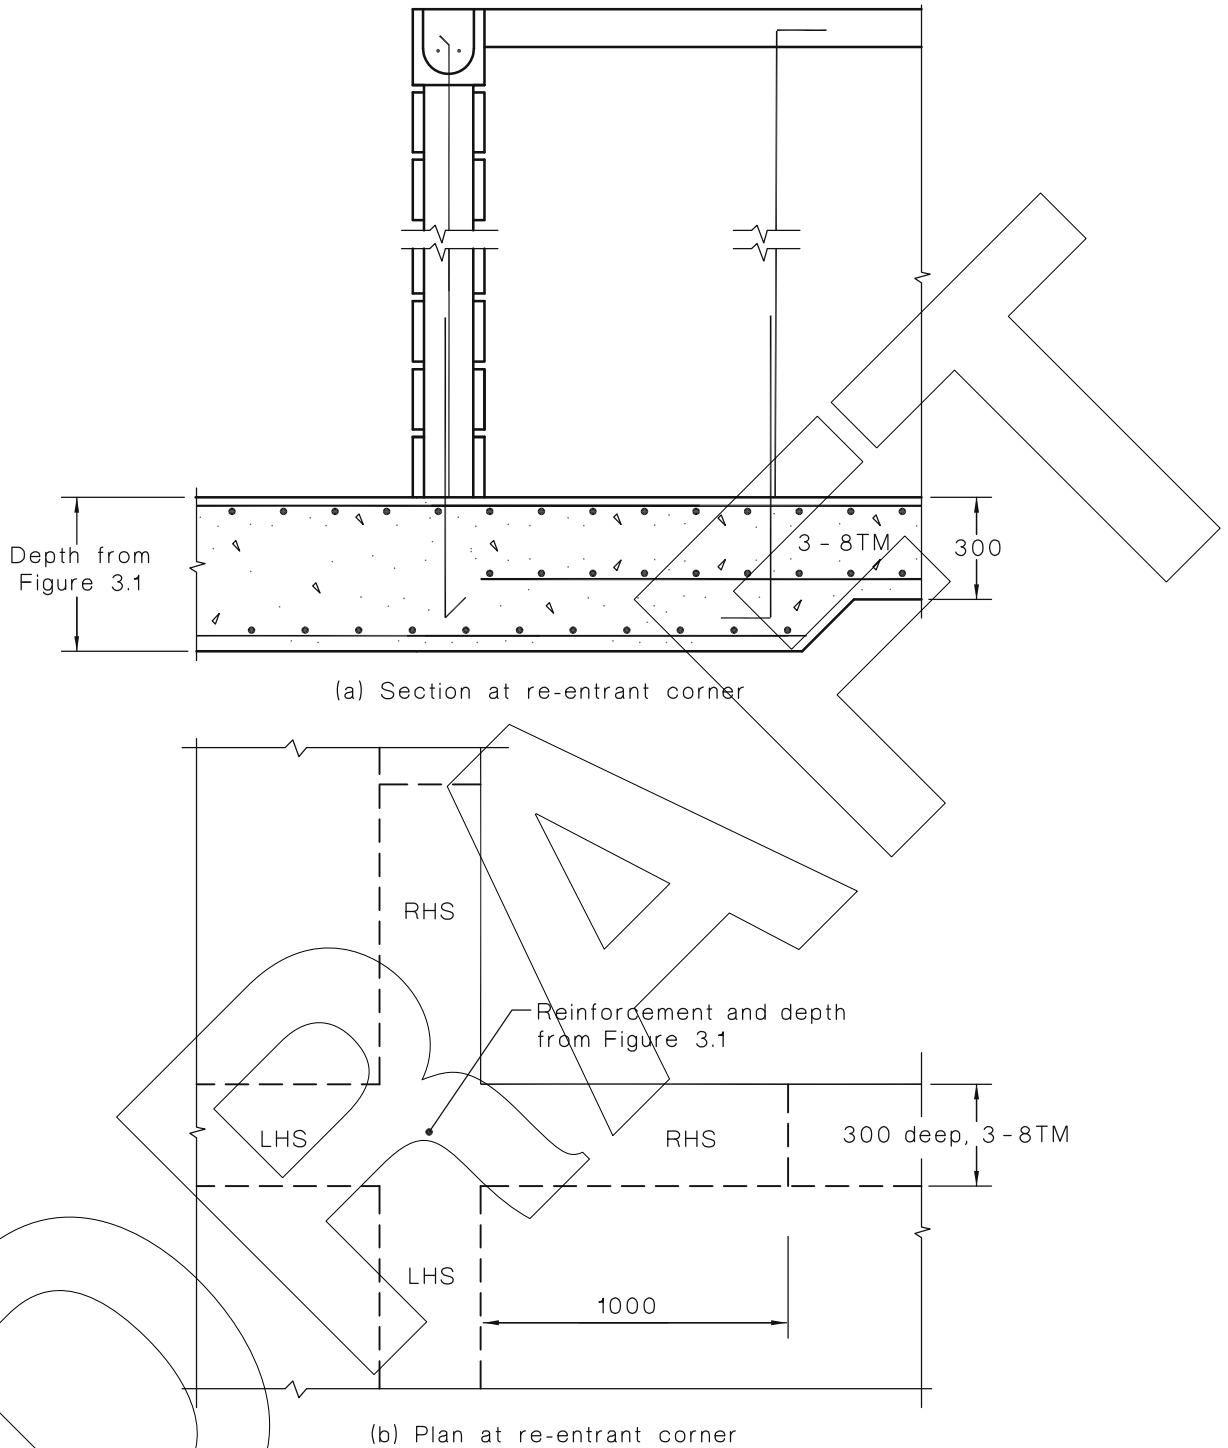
TYPICAL RE-ENTRANT CORNER DETAILS
